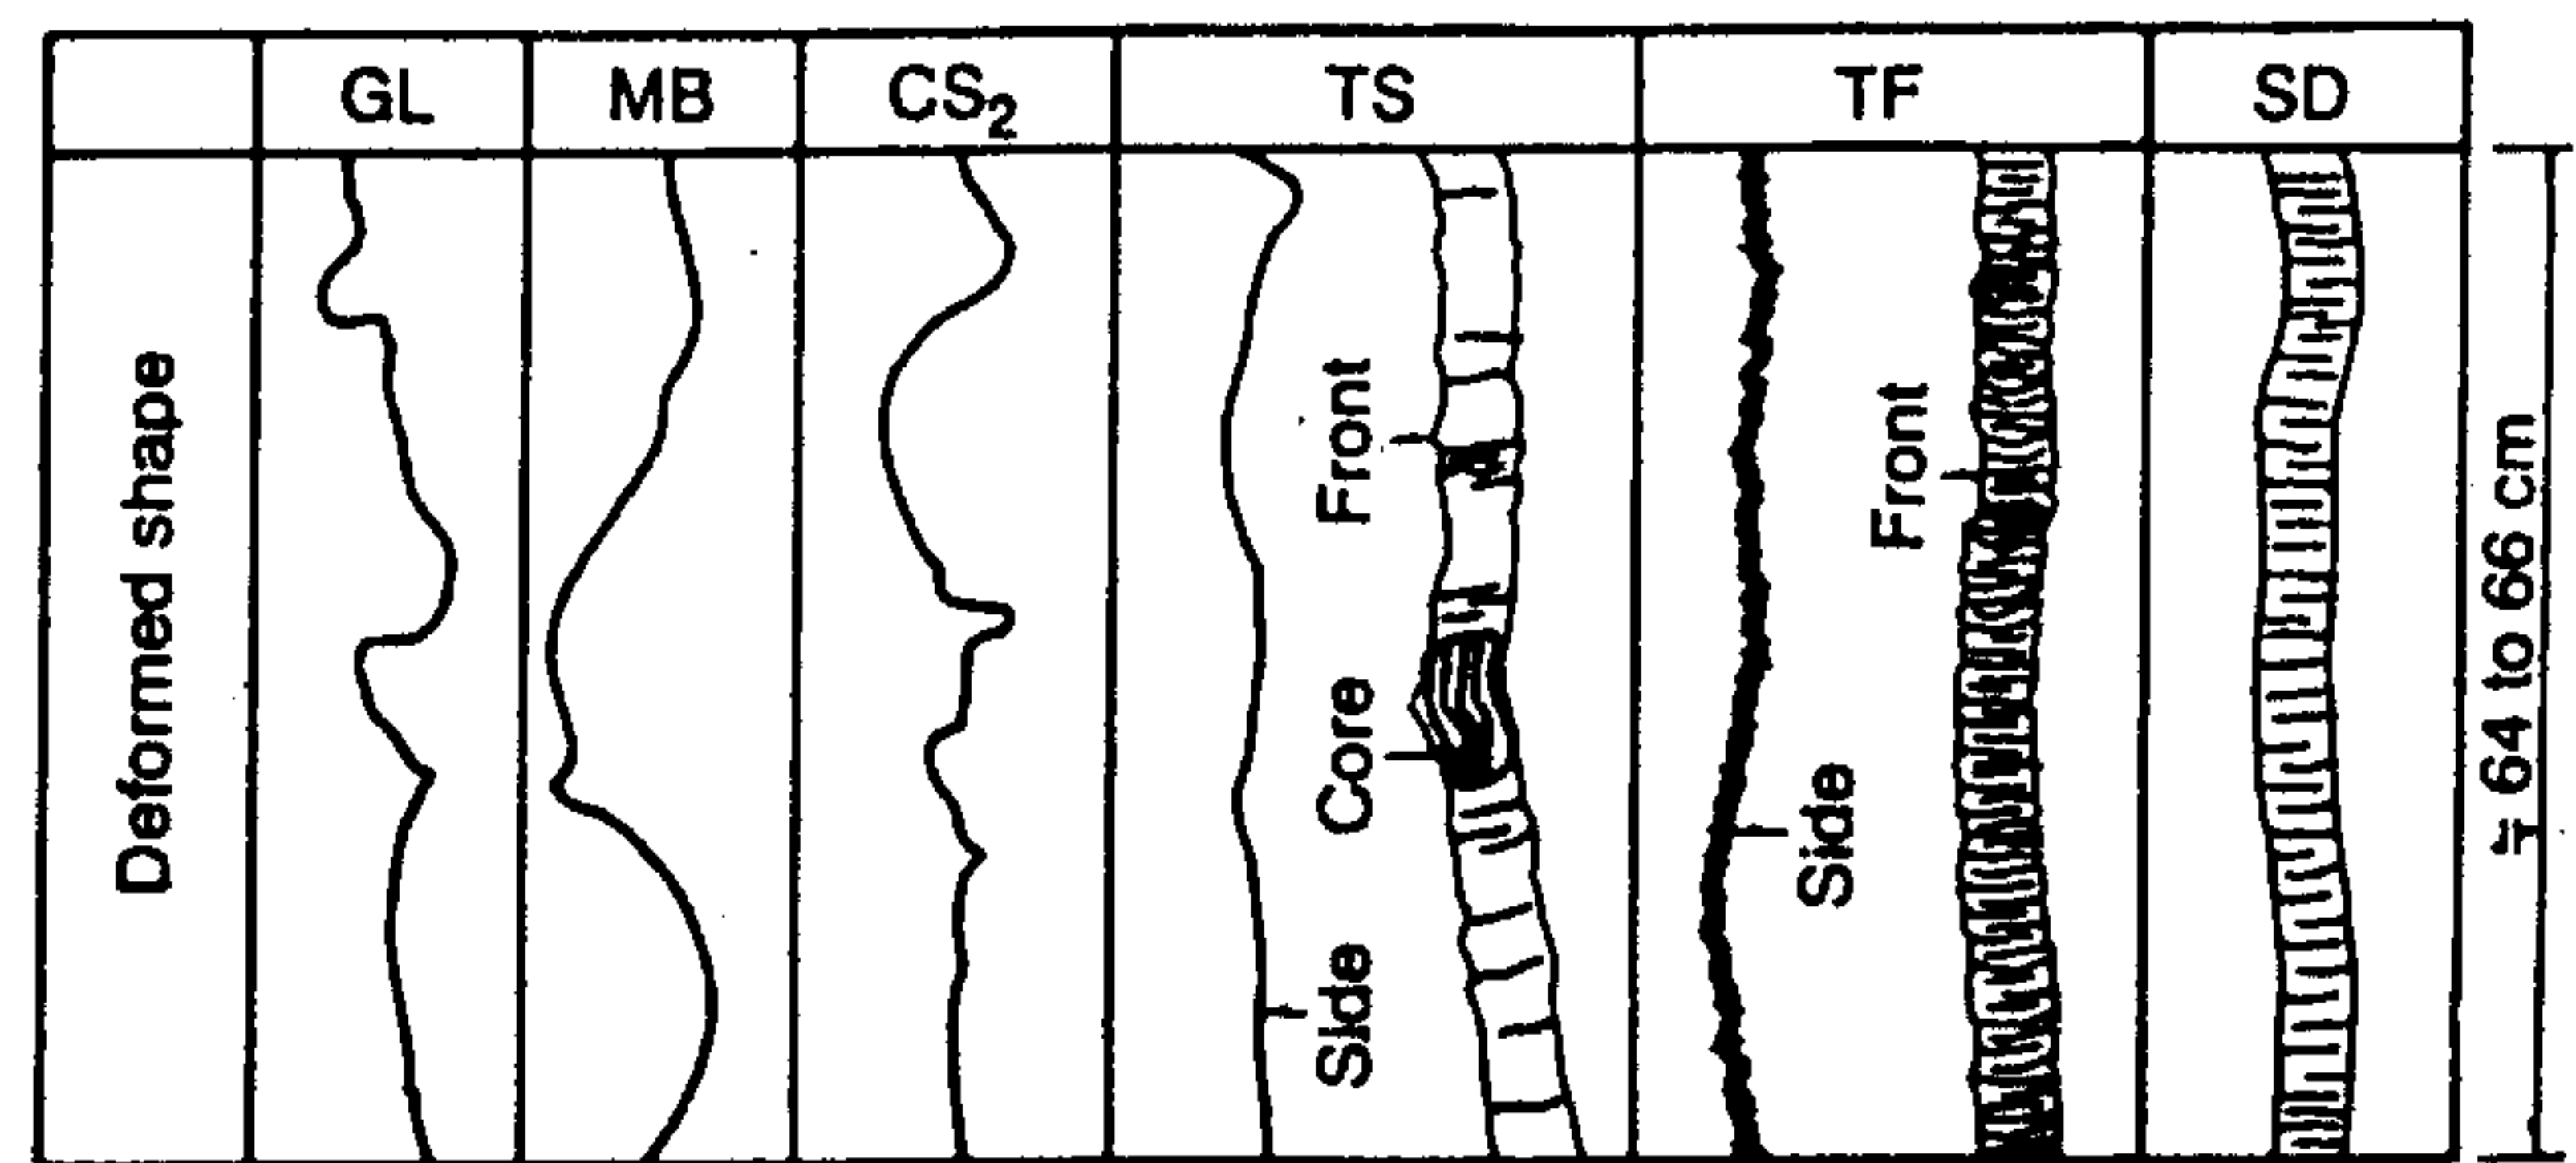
Deformed shapes of PD's and an SD after consolidation with vertical compressions greater than 20% (after Miura, et al 1993)
